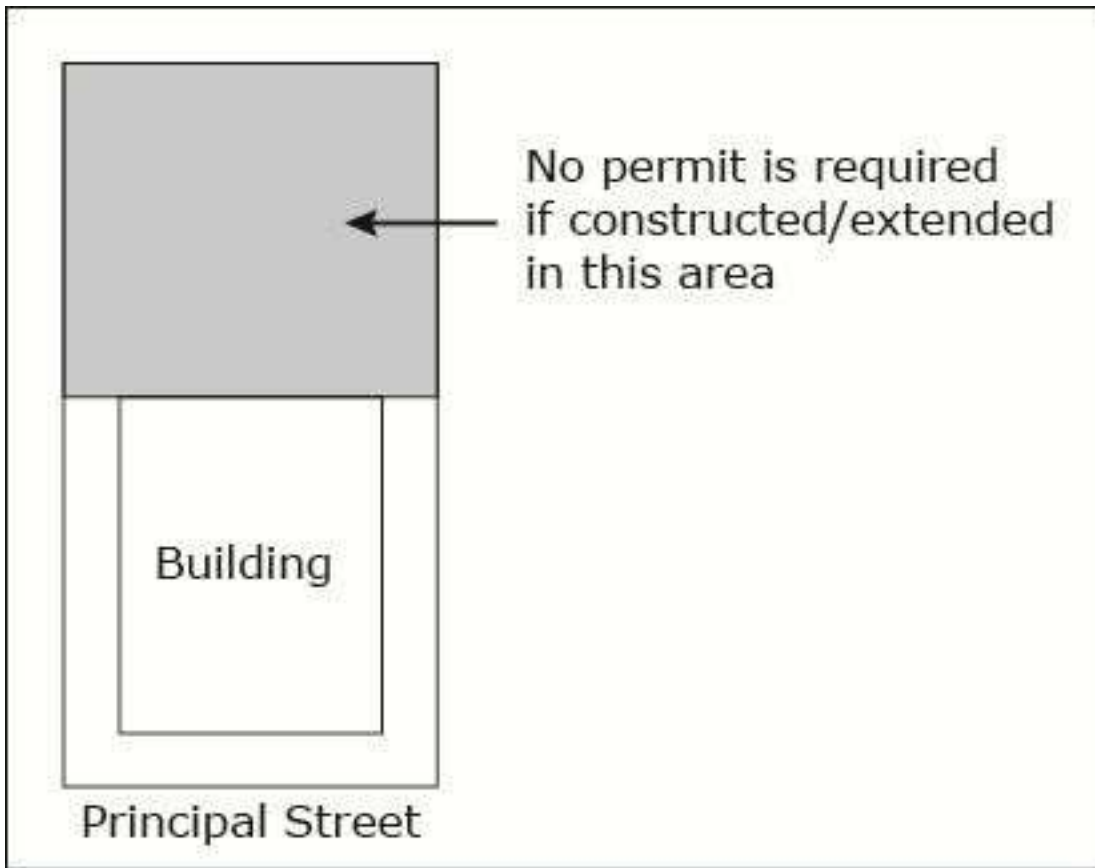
Construction/extension of a pergola/verandah to a contributory or not contributory property (not located on a corner site); and a deck to all properties.
